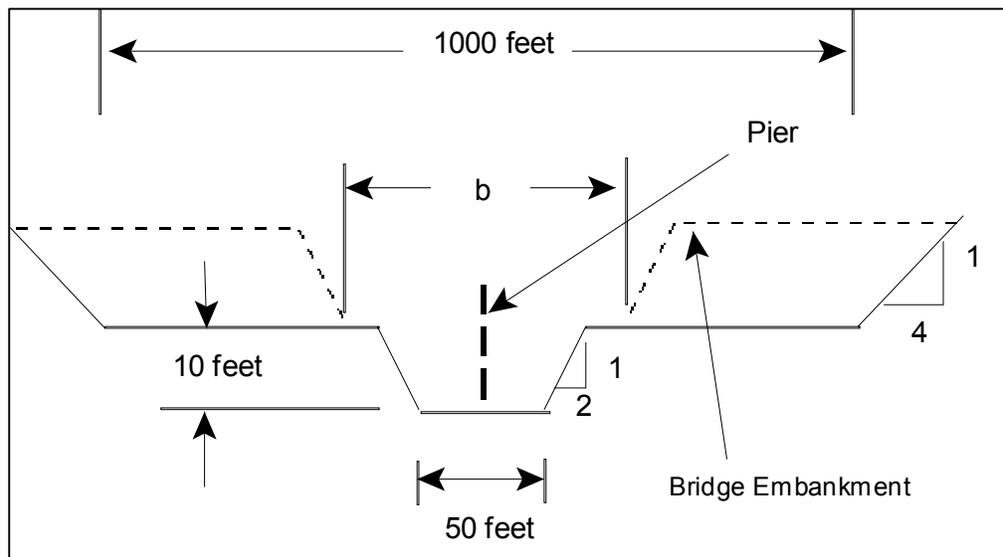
Typical Cross Section Layout for Bridge Modeling
